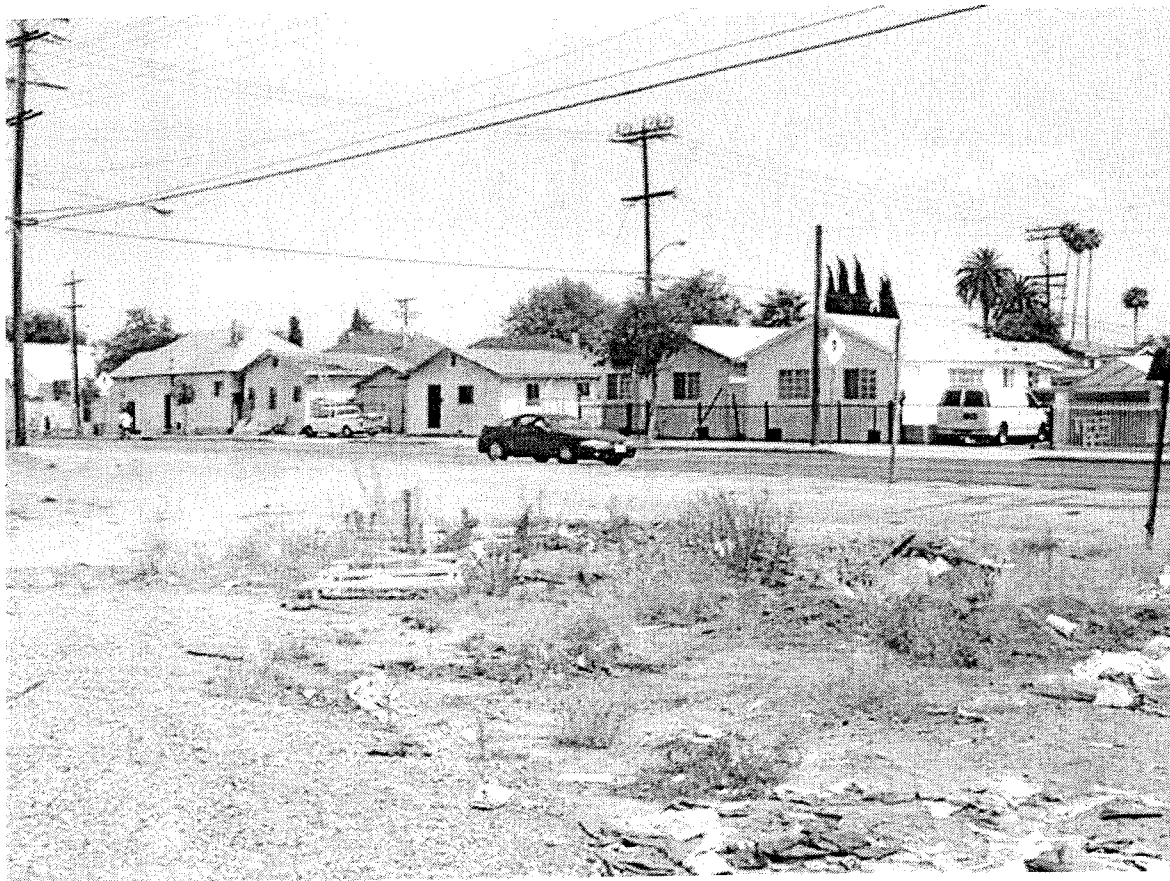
East end of project site looking south across Gage Ave. (June 5, 2003).
